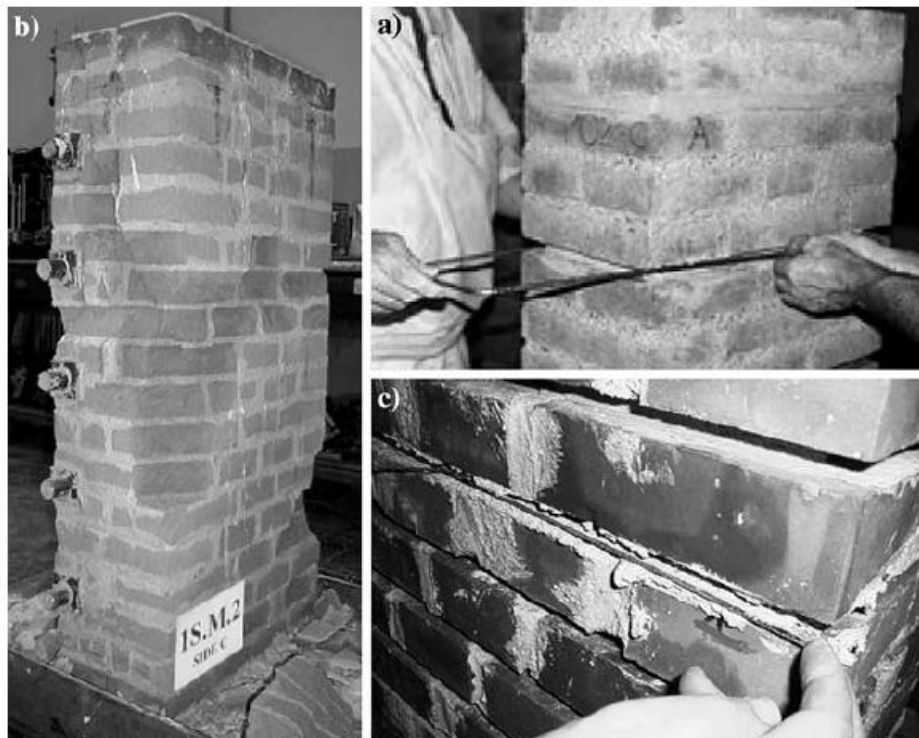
Example of panels strengthened with various types of reinforcement: (a) steel bars; (b) circular CFRP bars (anchoring in short sides with metal sleeves); (c) thin CFRP strips (no overlap at corner, unless specially designed elements are available)
